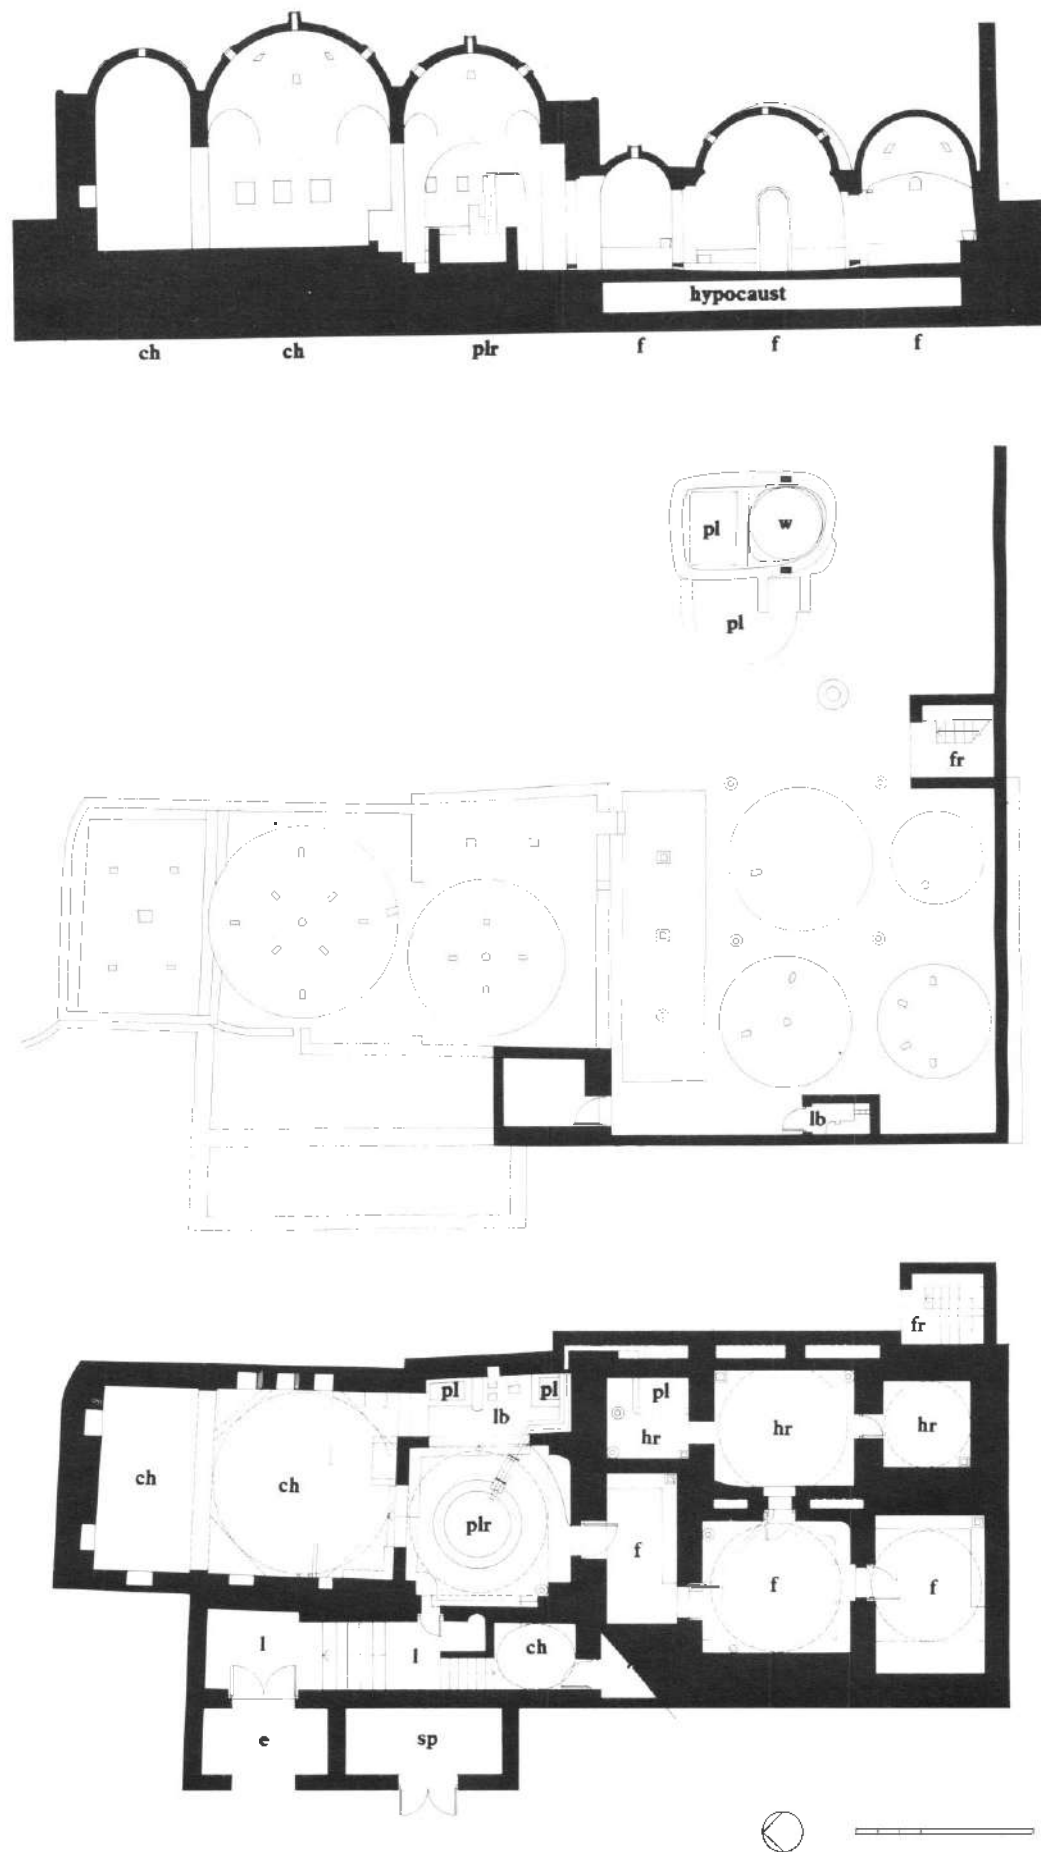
Hammām Saba'. The roof plan, ground plan and long section.
